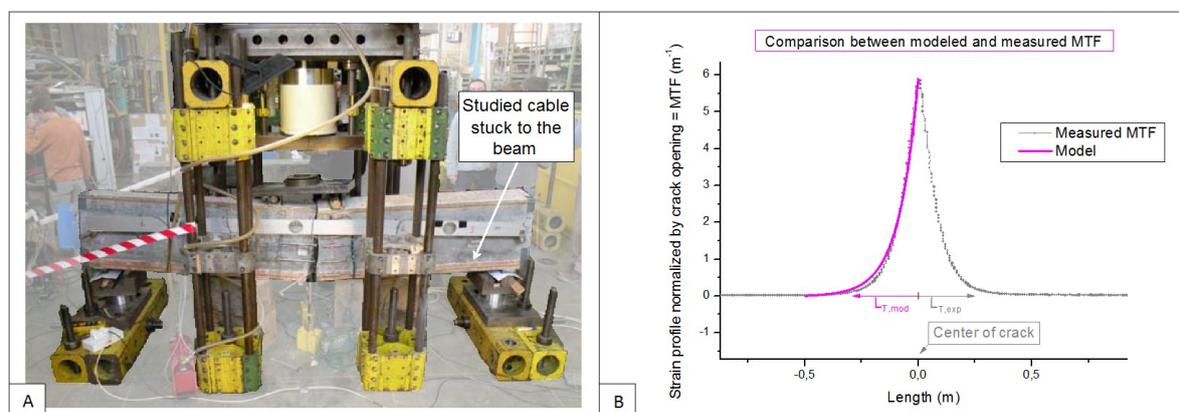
A – 4-points bending test on a plain concrete beam with a single crack formed in the central part.
